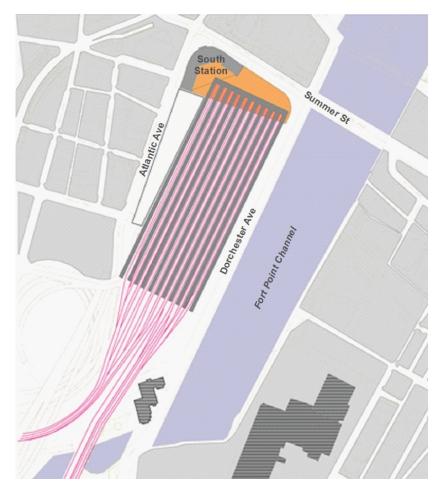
Unconstrained Rail Alternative 1 — 20 Tracks at Grade
